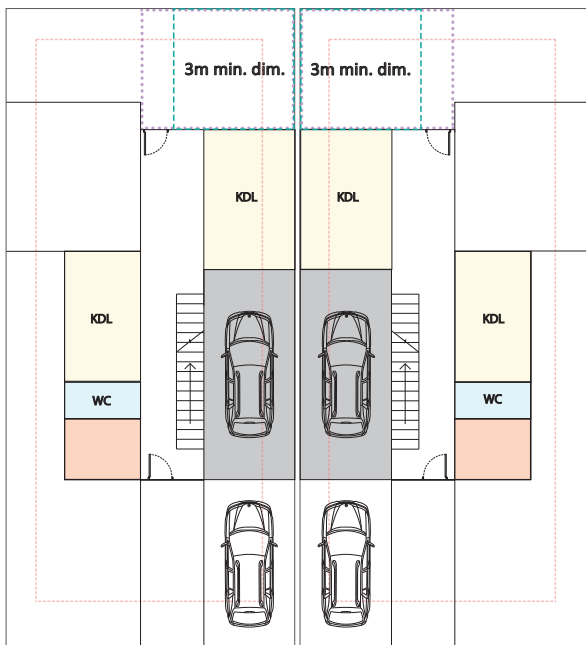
Floor plans for type EOT2 - Refer fig 66.67 (page 58) for further details
